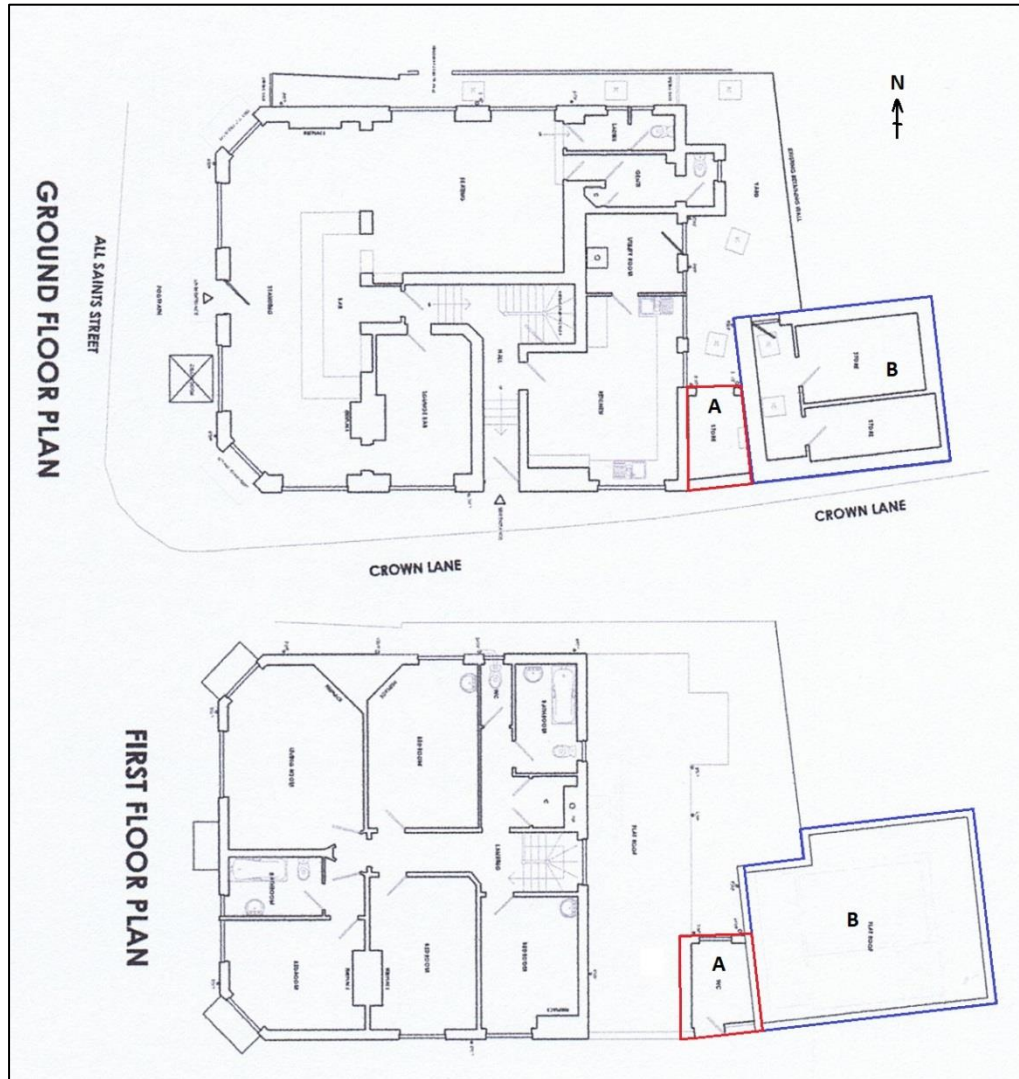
Crown Inn, Hastings: Plans of Buildings A & B
